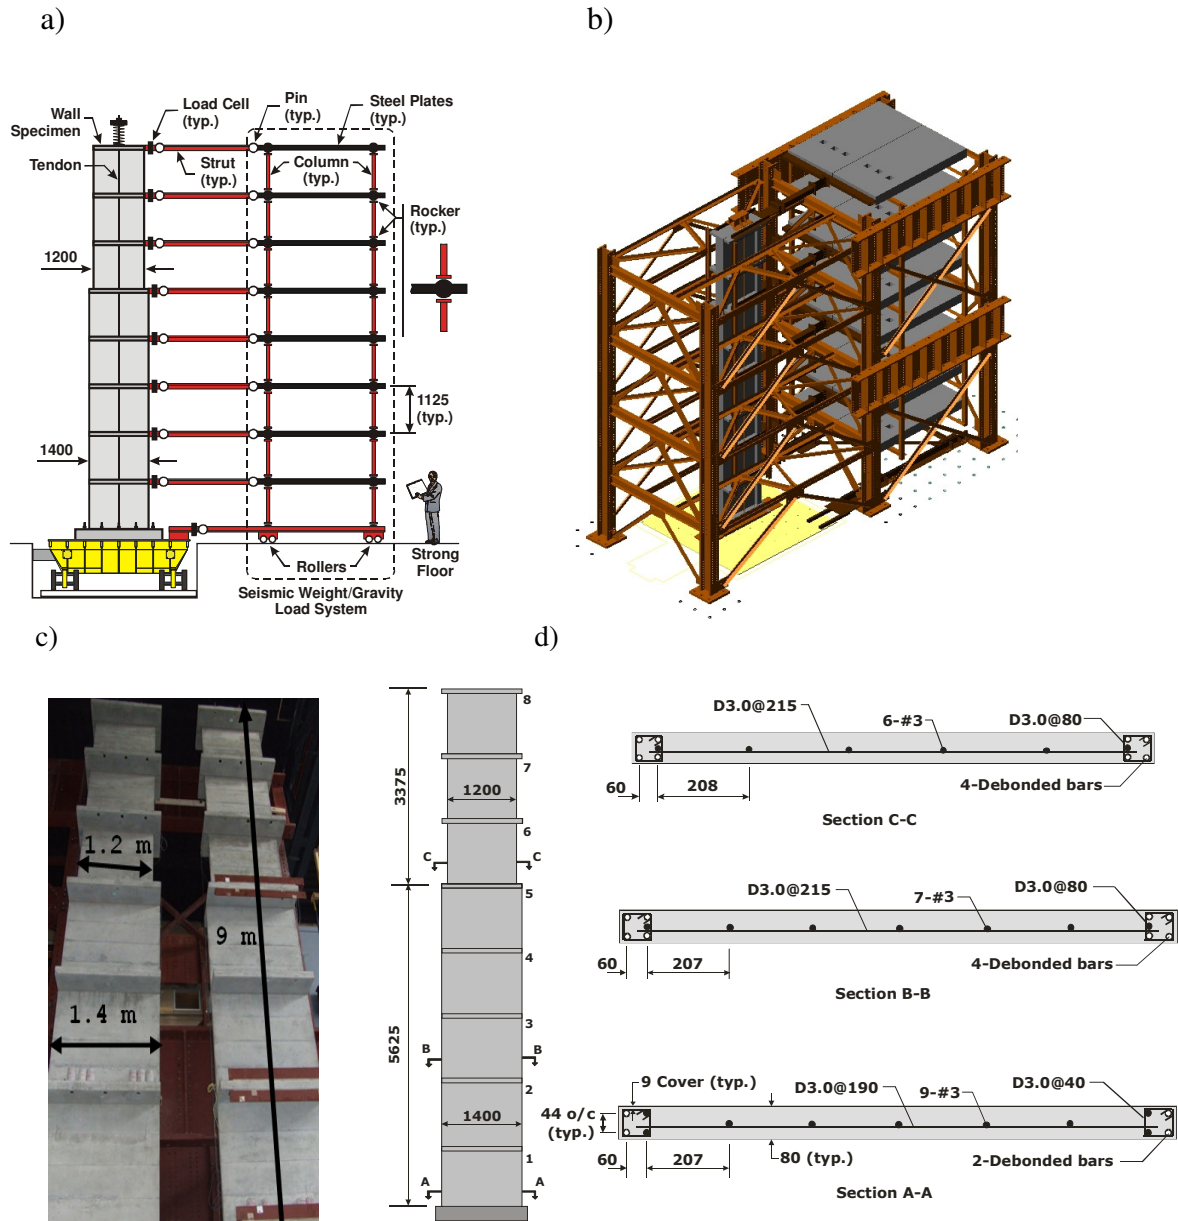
(a) Test specimen and seismic weight/gravity load system; (b) complete test setup with a stabilising steel frame; (c) model wall; and (d) cross-section of the model wall.
